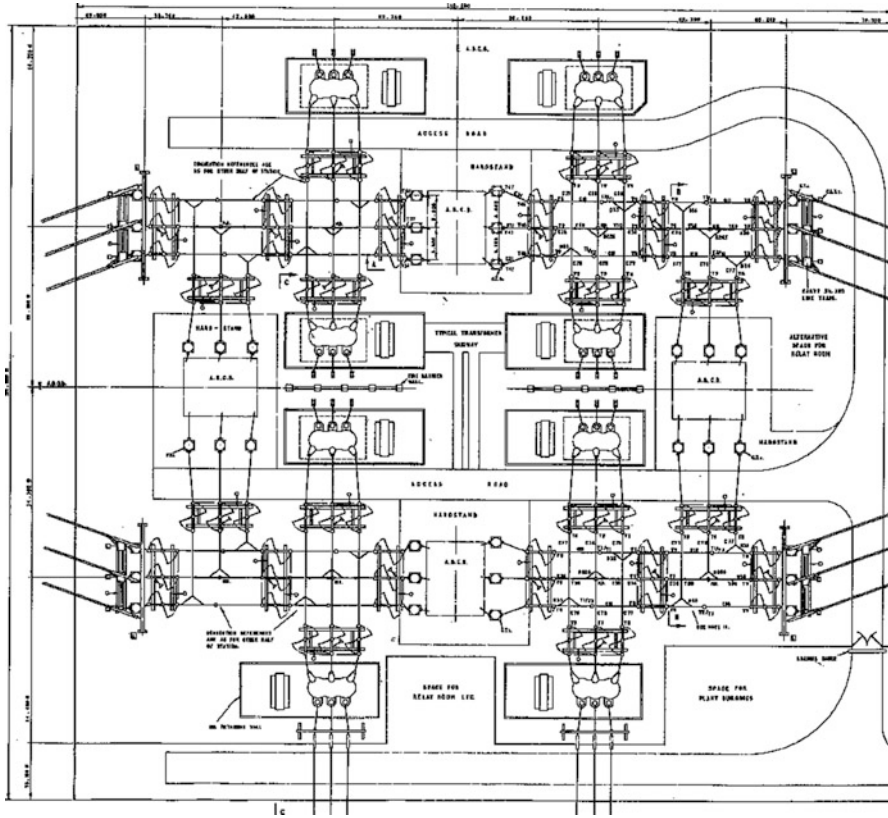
Overall plan view of four-switch mesh with two transformers banked on each corner
